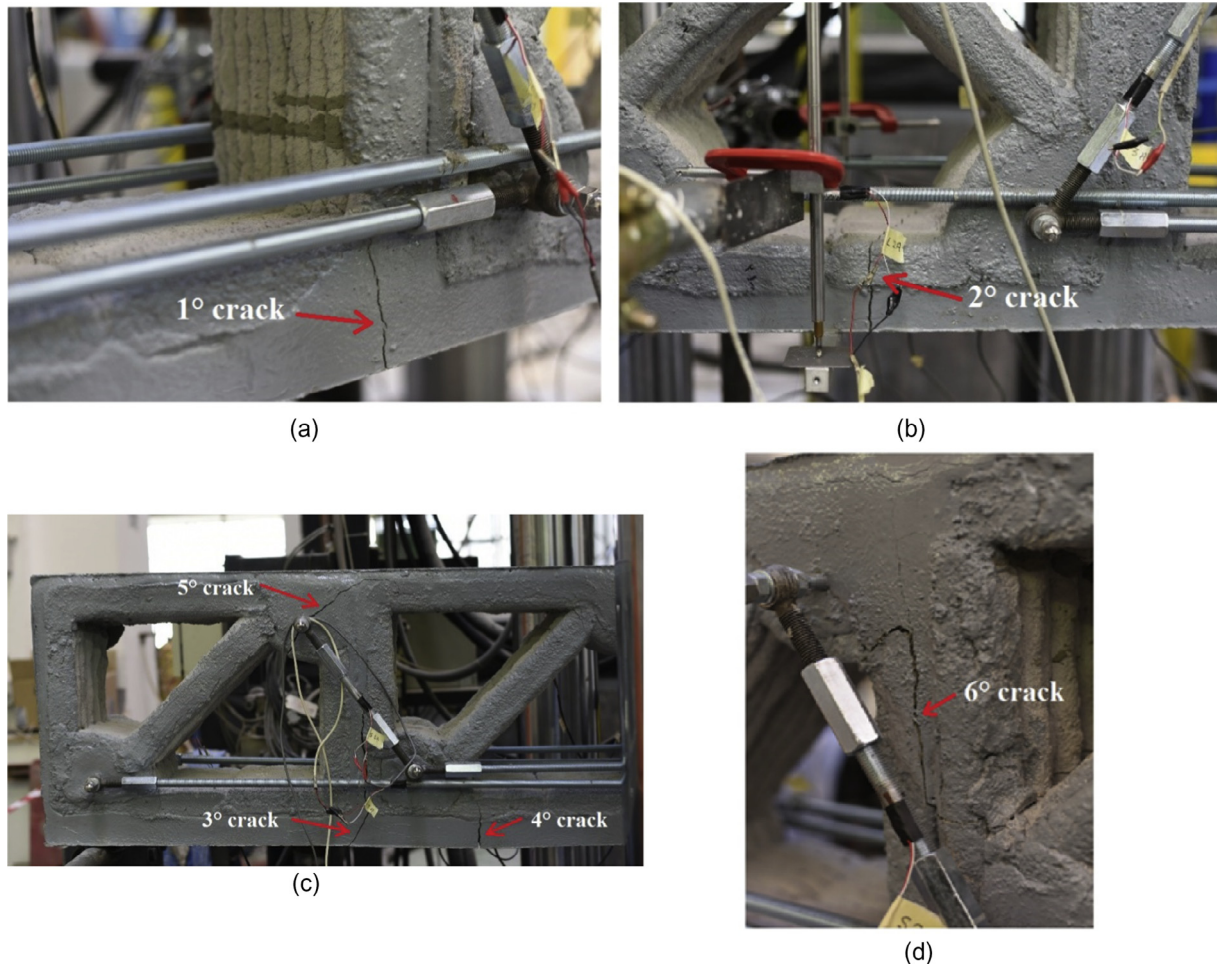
(a) 1st crack; (b) 2nd crack; (c) front view of the 3rd, 4th and 5th cracks; (d) 6th crack (d).
